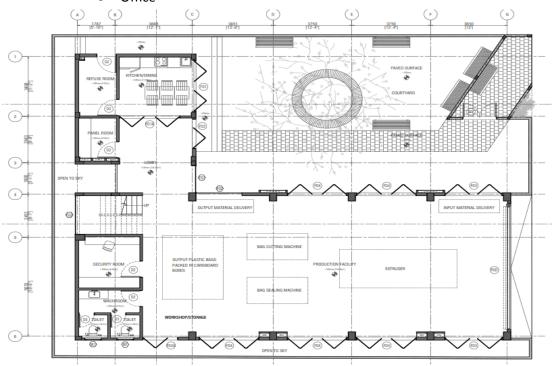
Ground floor layout. Building drawings are attached as an annex.
